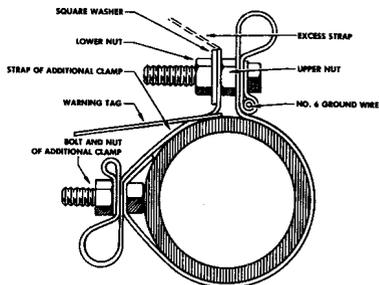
Attaching L Ground Clamp to Pipes Larger than 3 Inches
